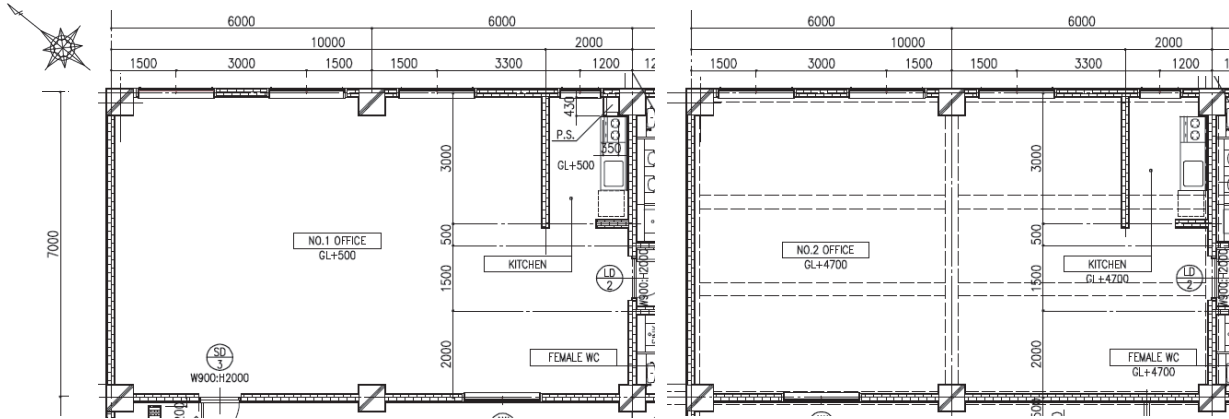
Plan of First (left side) and Second (right side) Floor Offices
